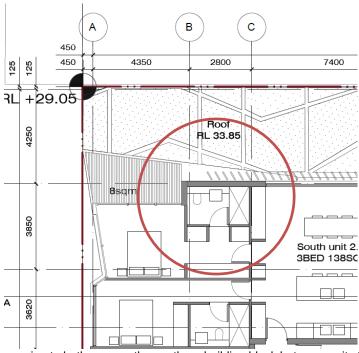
No window opening to bathroom on the southern building block between units 2.01 - 6.01 (shown at Levels 02 to 06)
